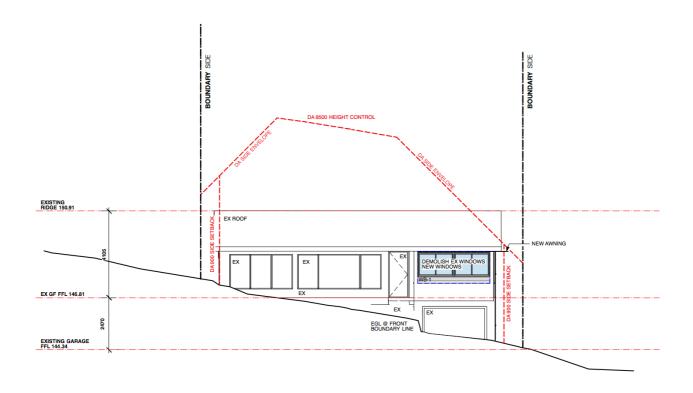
Proposed amended windows, East (Front, Jones St) Elevation
